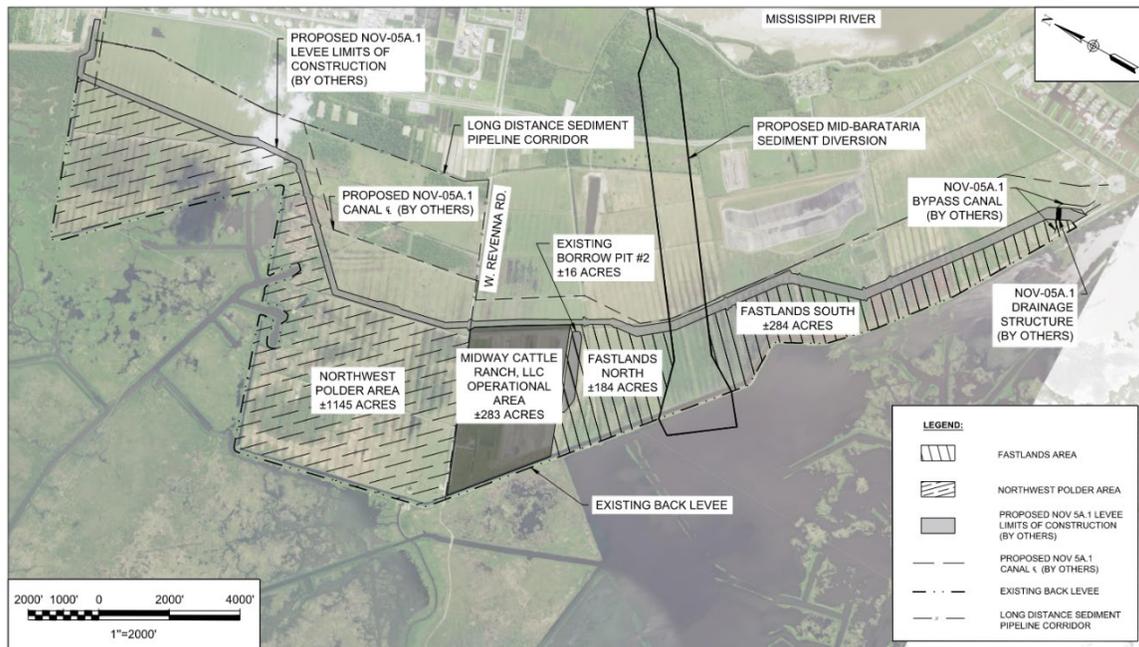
Fastlands Dredged Material Placement Areas Alternative
